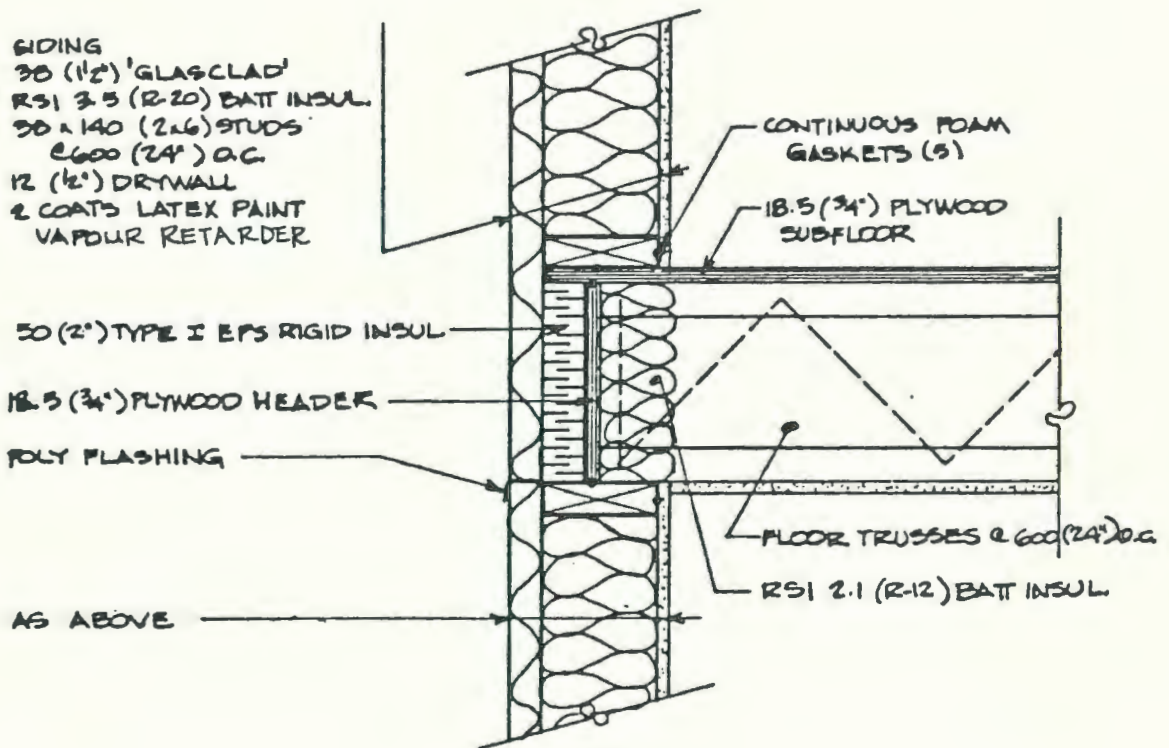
Exterior Wall at Second Floor - Alberta Demonstration Project
